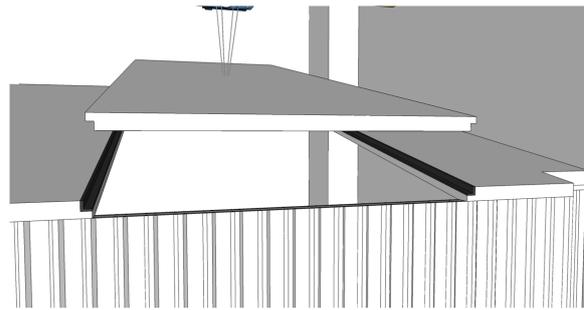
Layout of acoustic ceiling - partly detachable (detail)
